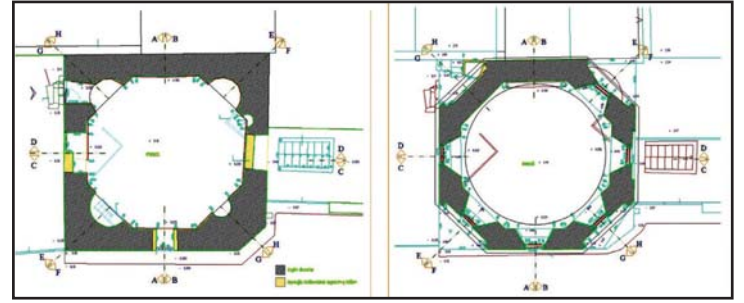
Square ground floor plan of the sanctuary between the levels of +5.58 and +8.85
